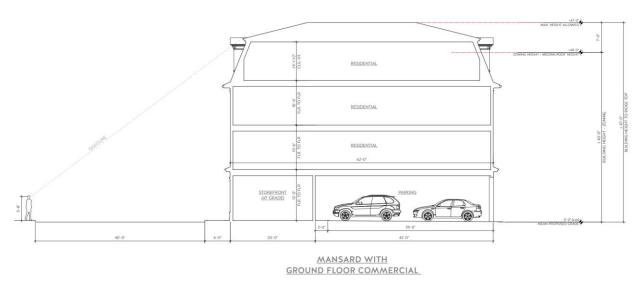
Proposed Building Height for the Mixed-Use Hanover Street Building
